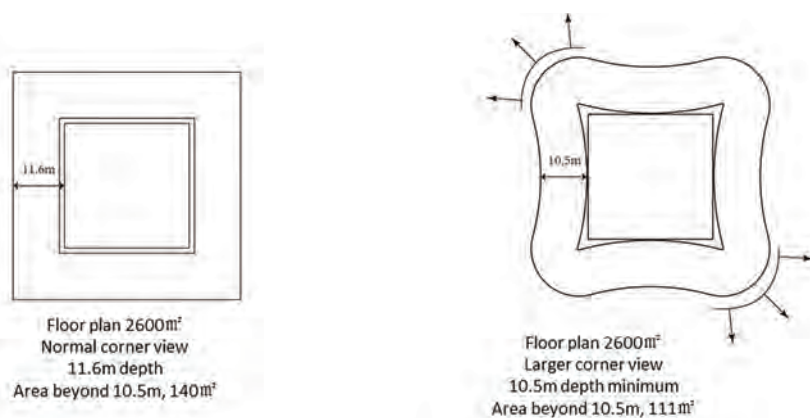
Comparison of plan layouts of Nanning Tower (Source: Yu Wang)
